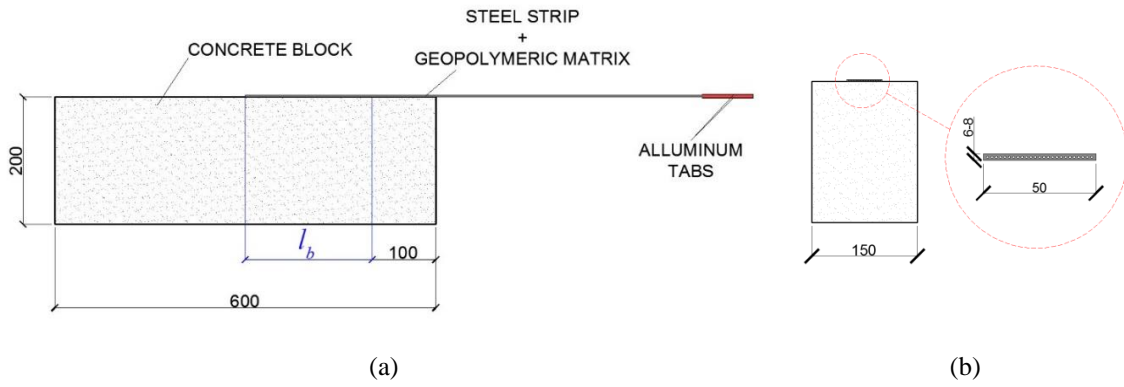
Geometrical details of test specimens: (a) Longitudinal section; (b) Transversal section (all dimensions are in mm).
